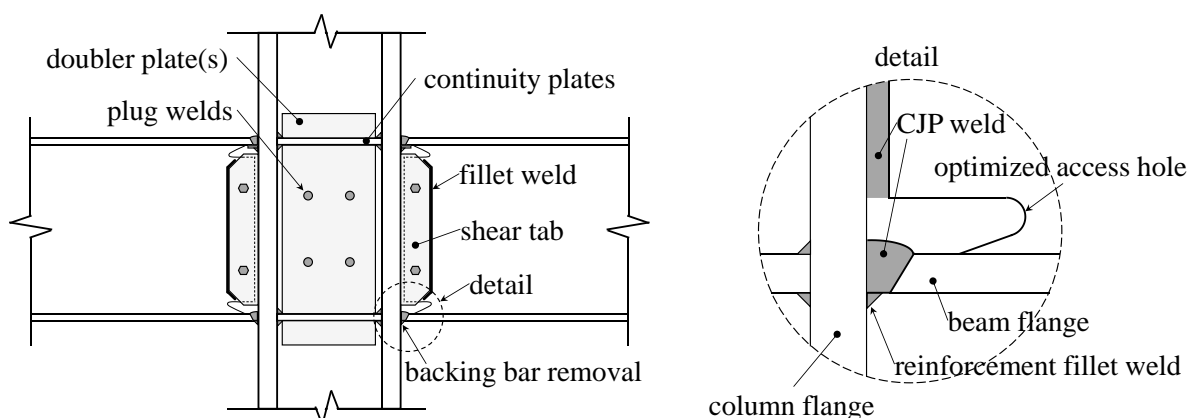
Typical post-Northridge fully restrained welded unreinforced flange-welded web (WUF-W) beam-to-column connection detailing.
